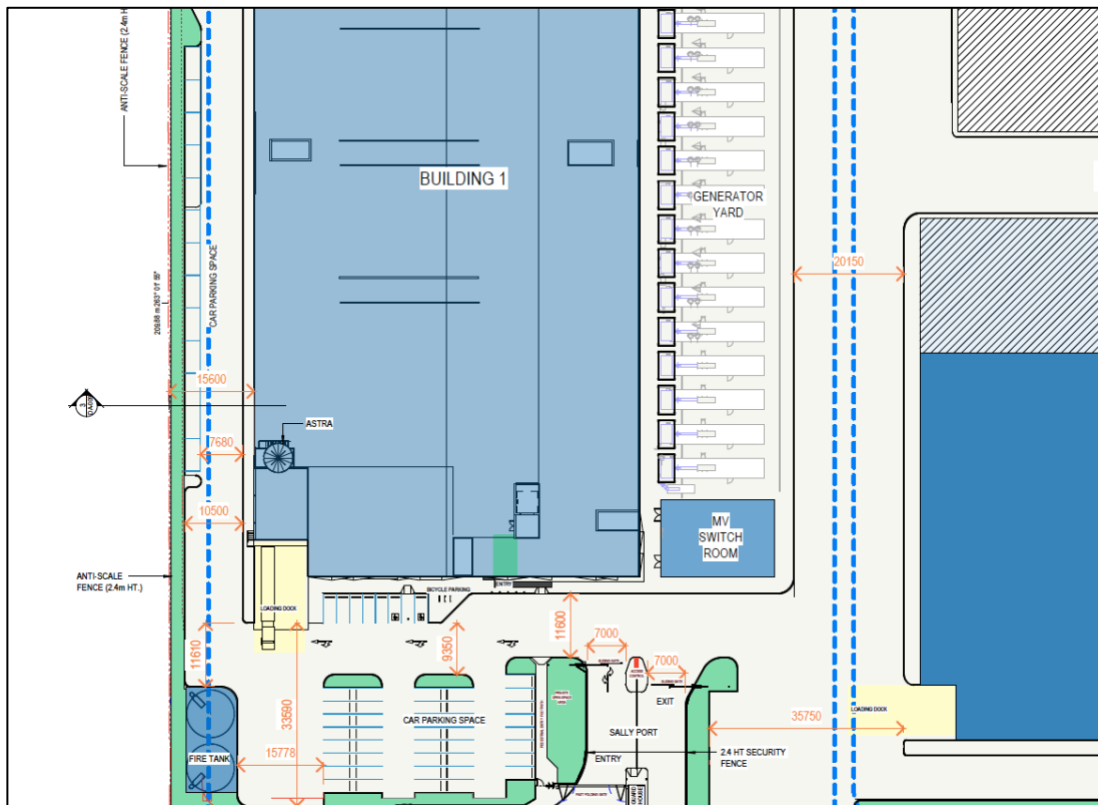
Site plan demonstrating proposed car parking (Source: Metier3)
